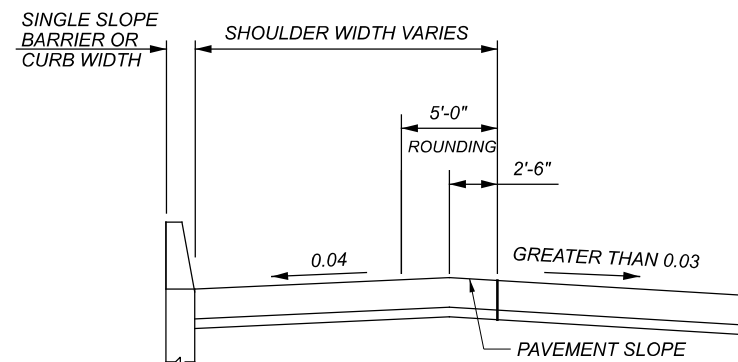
CURBED-HIGH SIDE OF SUPERELEVATED SECTION
